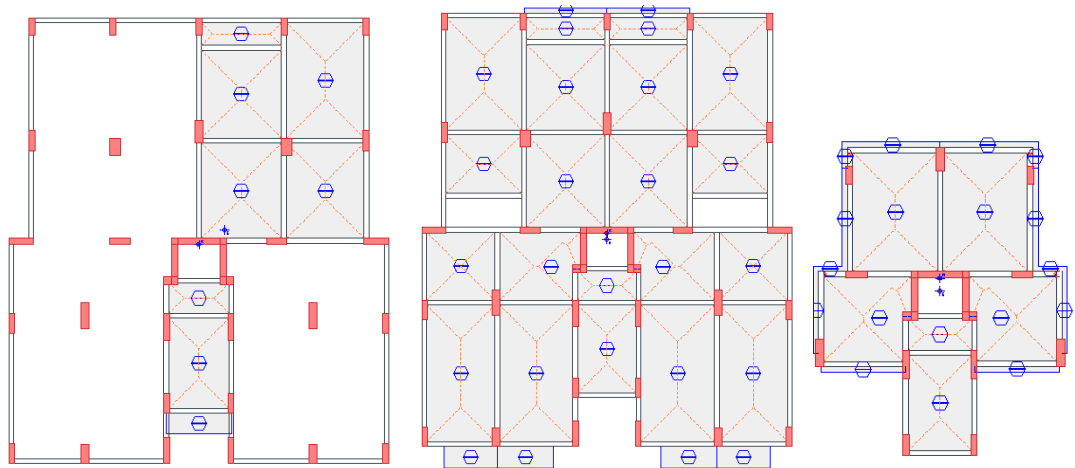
a) 2<sup>st</sup> Floor, b) Normal Floor, c) Top Floor Plans of the Building
